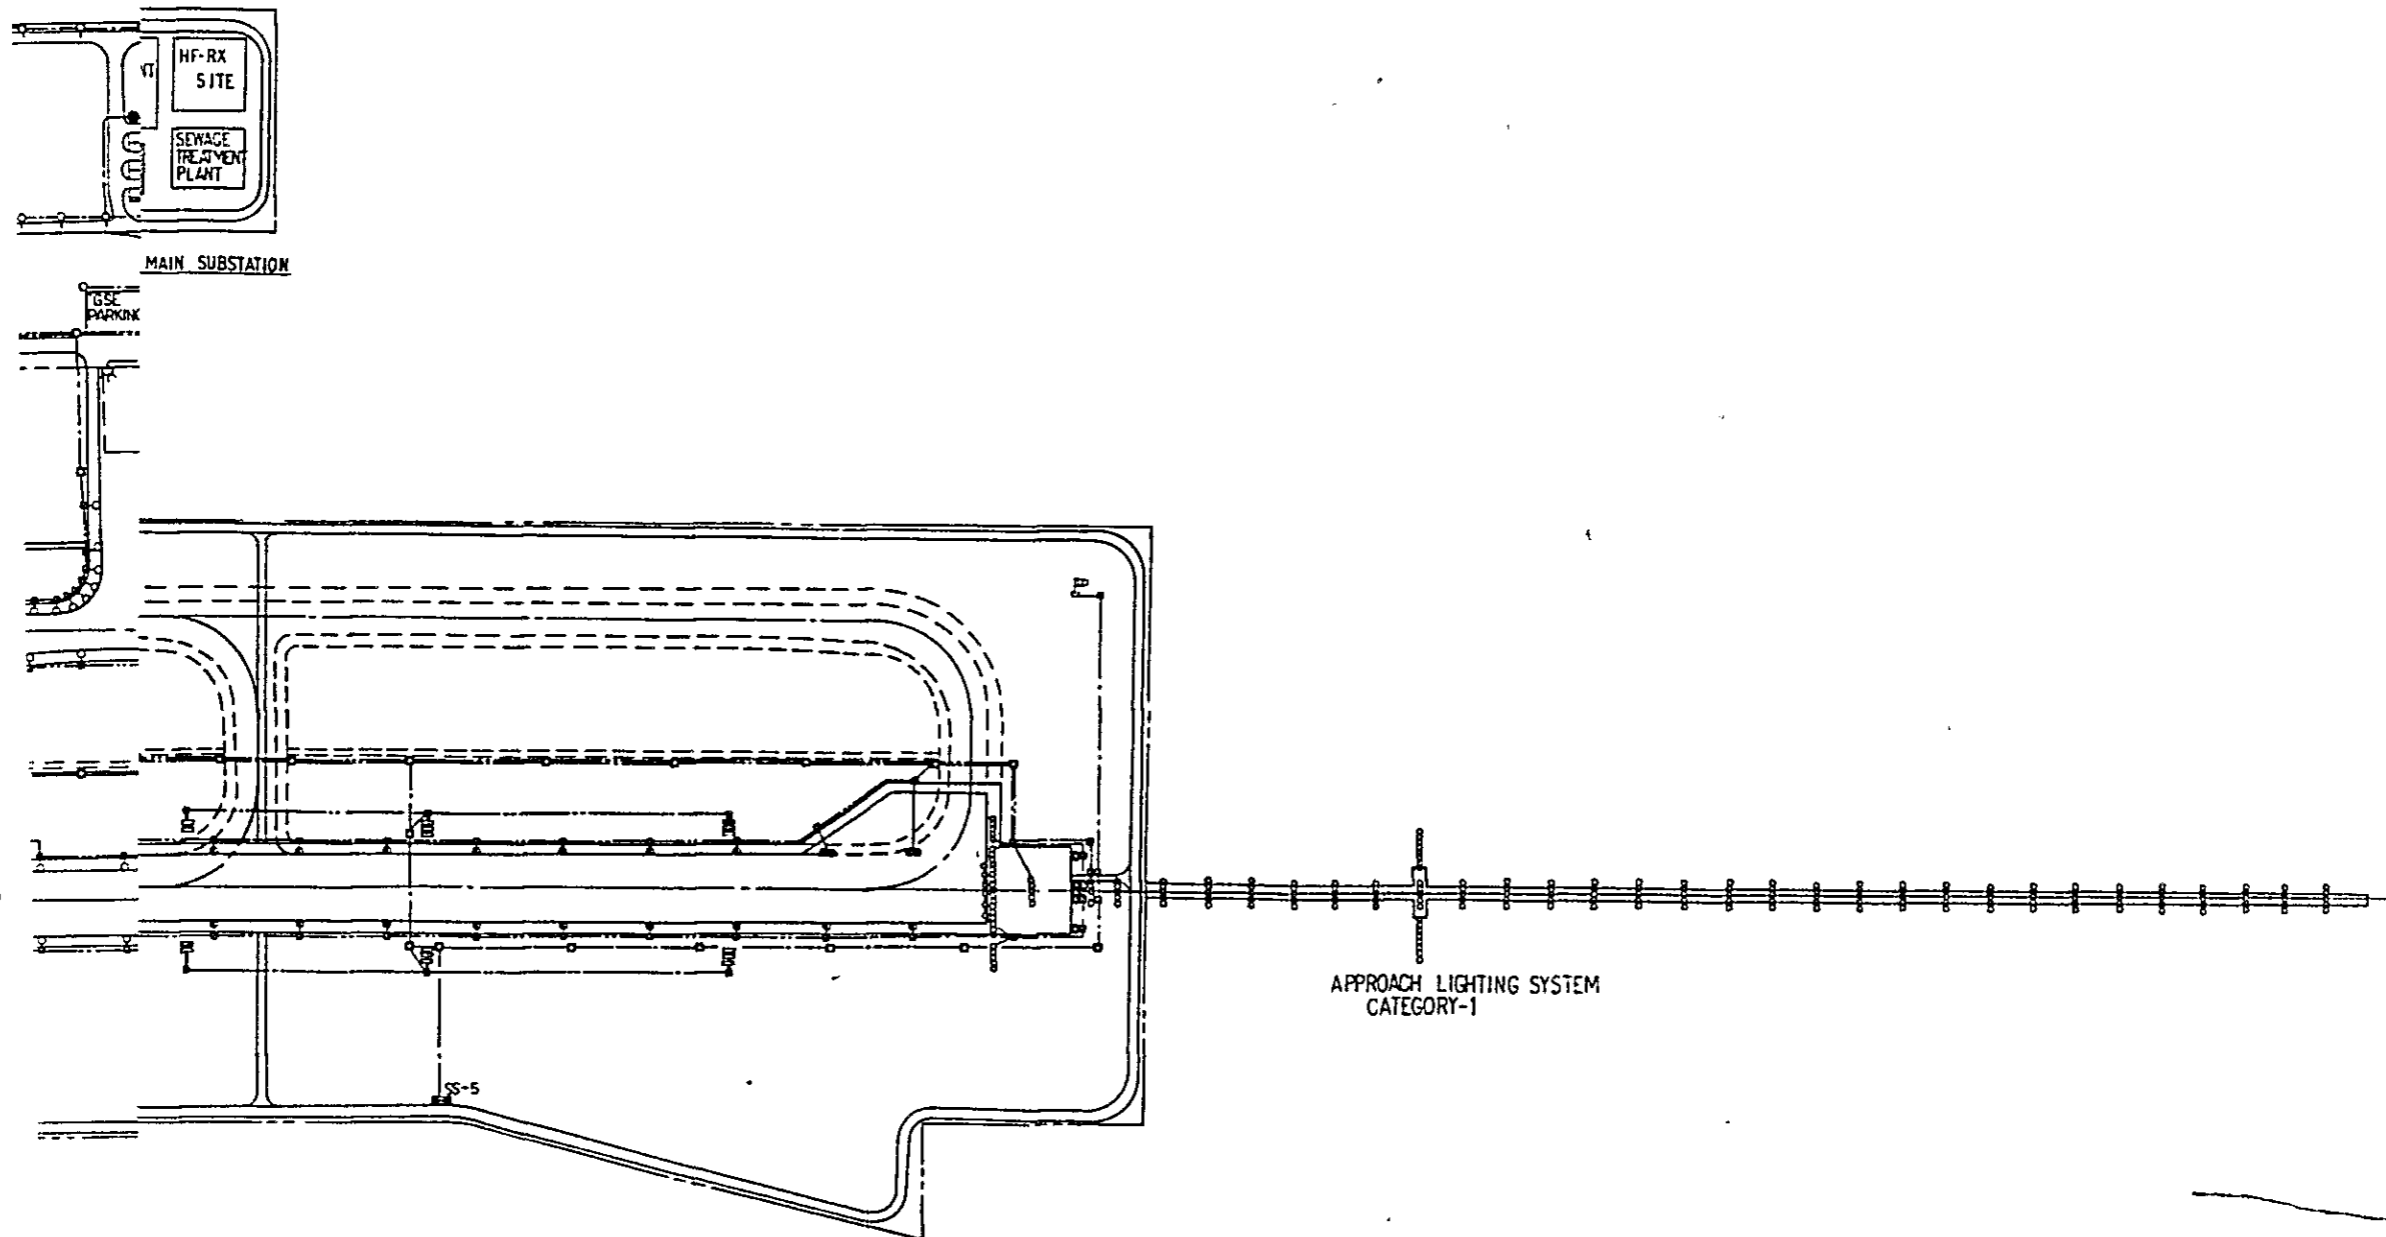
AERONAUTICAL GROUND LIGHTS LAYOUT PLAN
